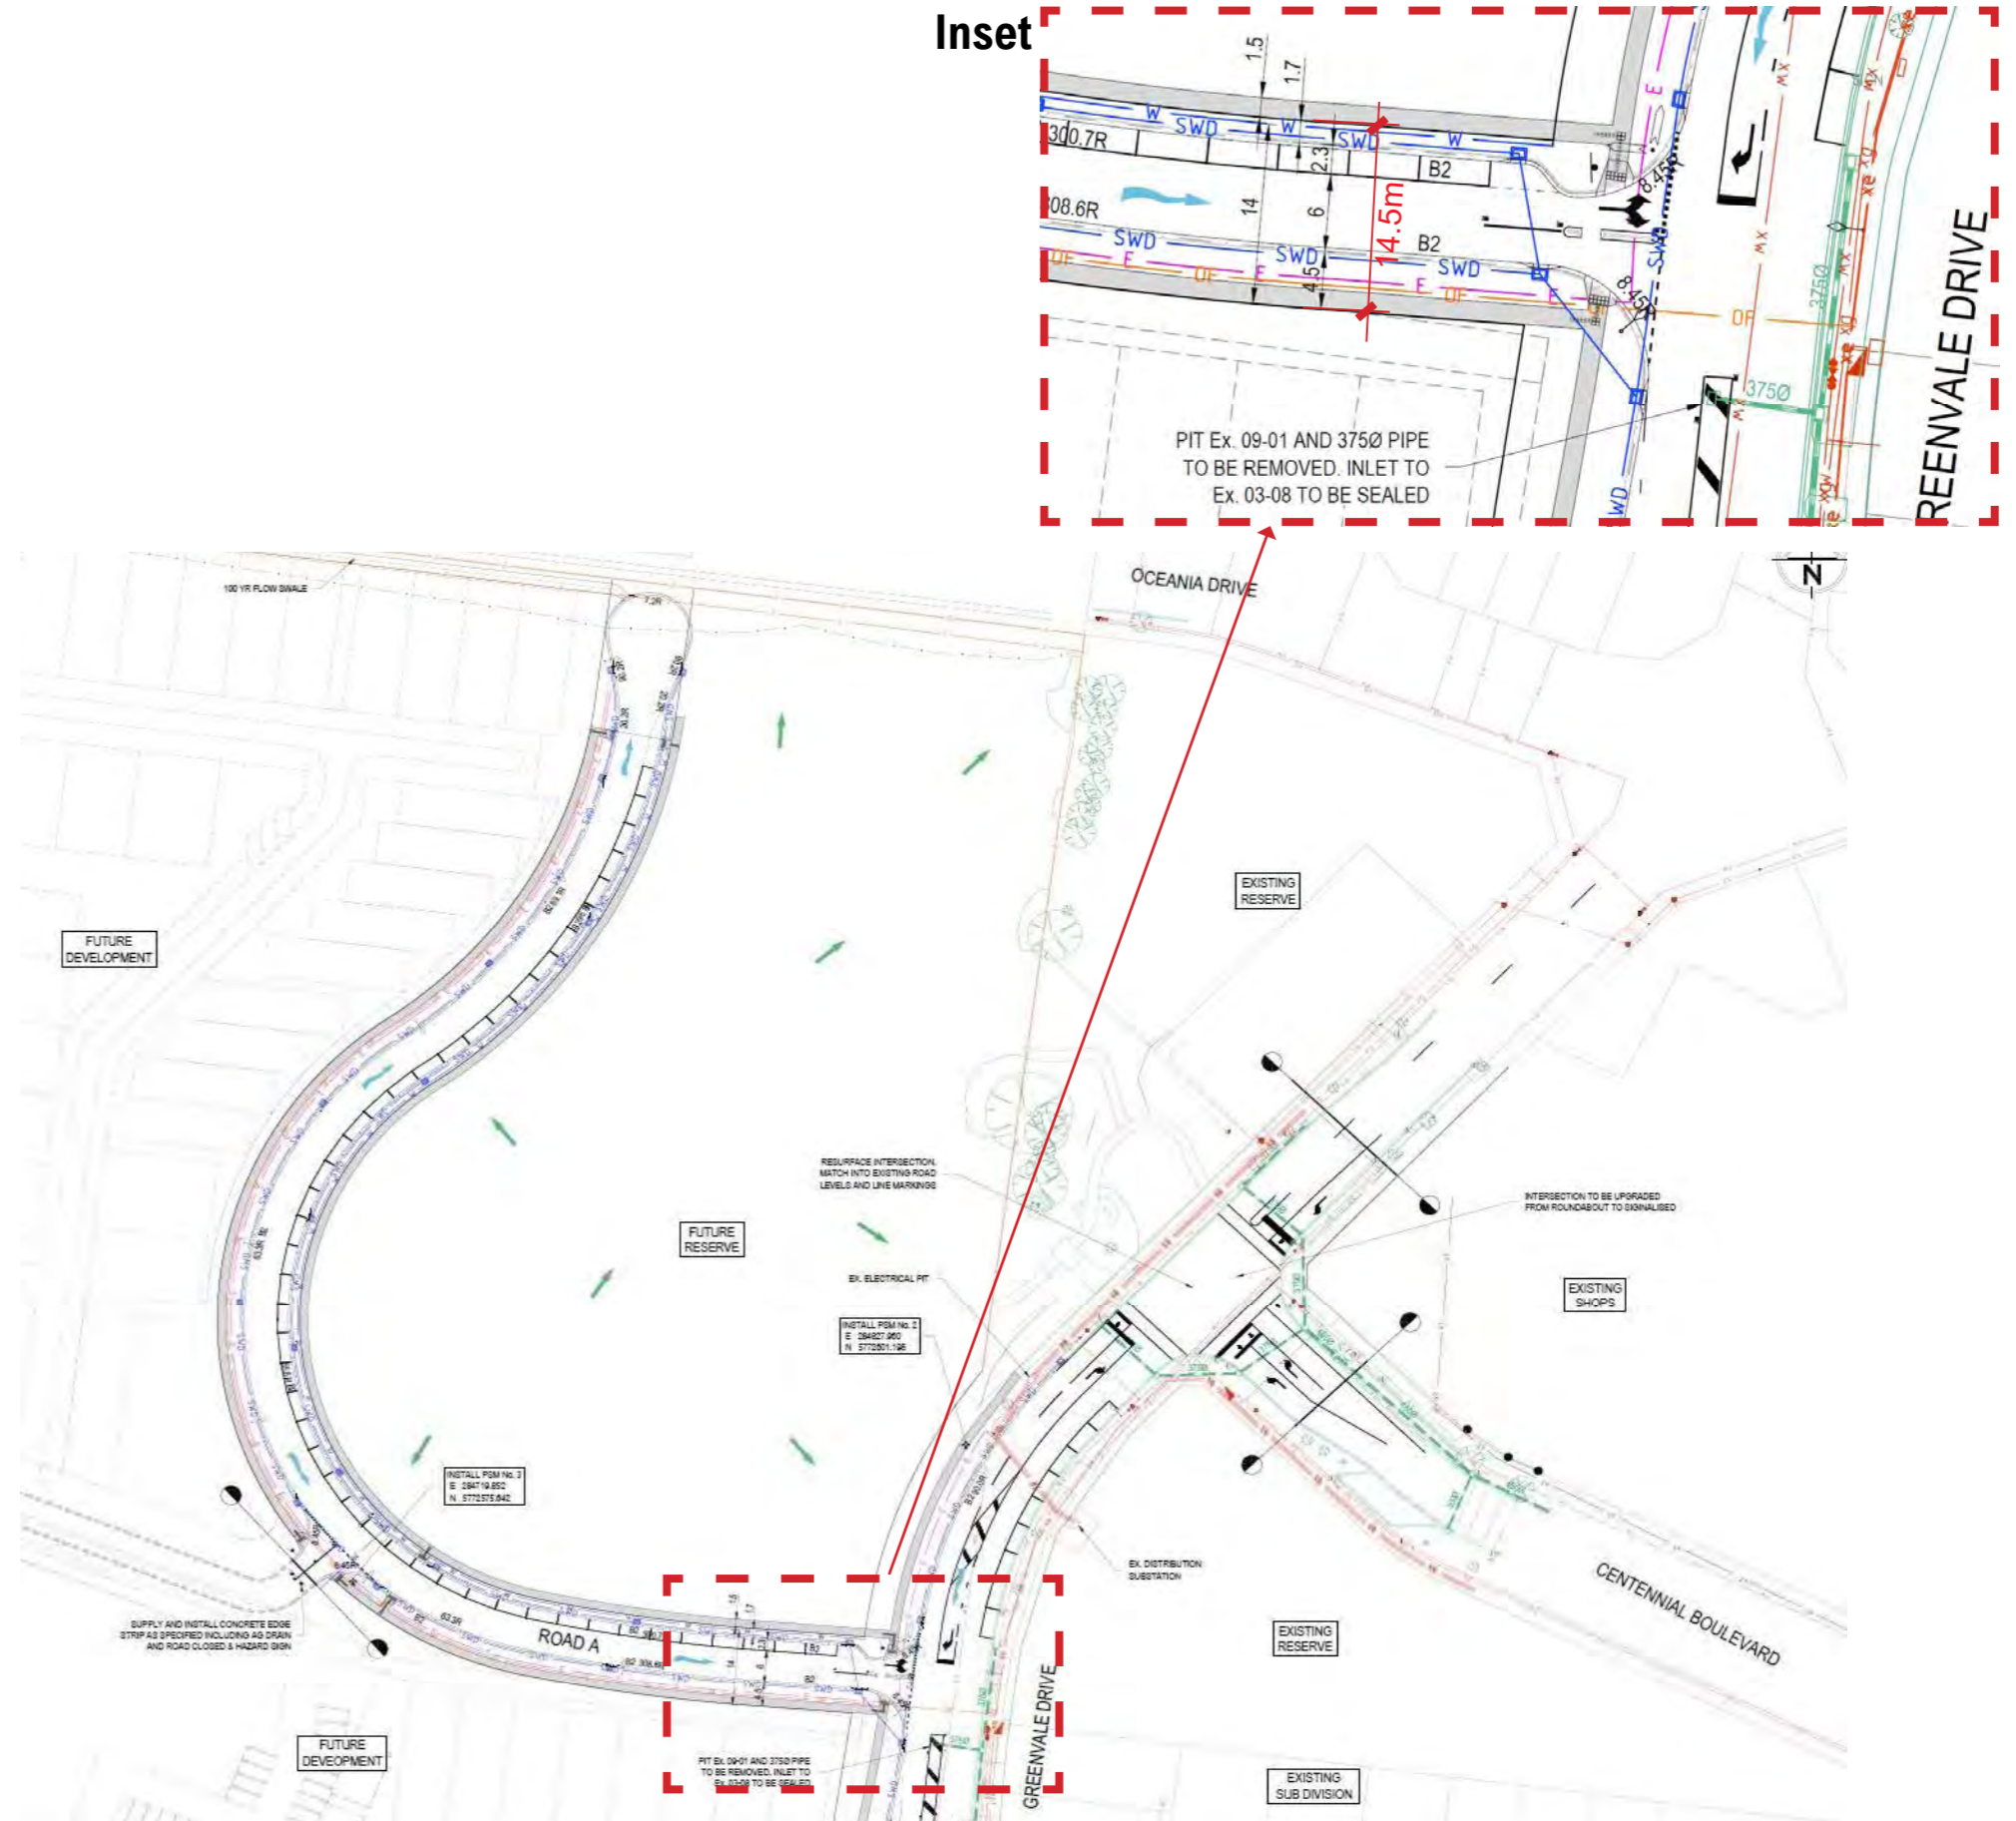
Extract of Stockland's FLP drawing, with inset showing Road A cross section dimensions
